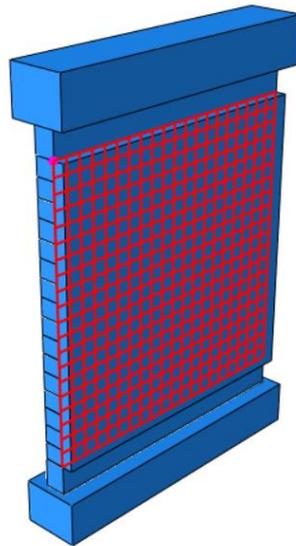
; Connection of Shotcrete Concrete and a Rebars Mesh inside the Concrete
